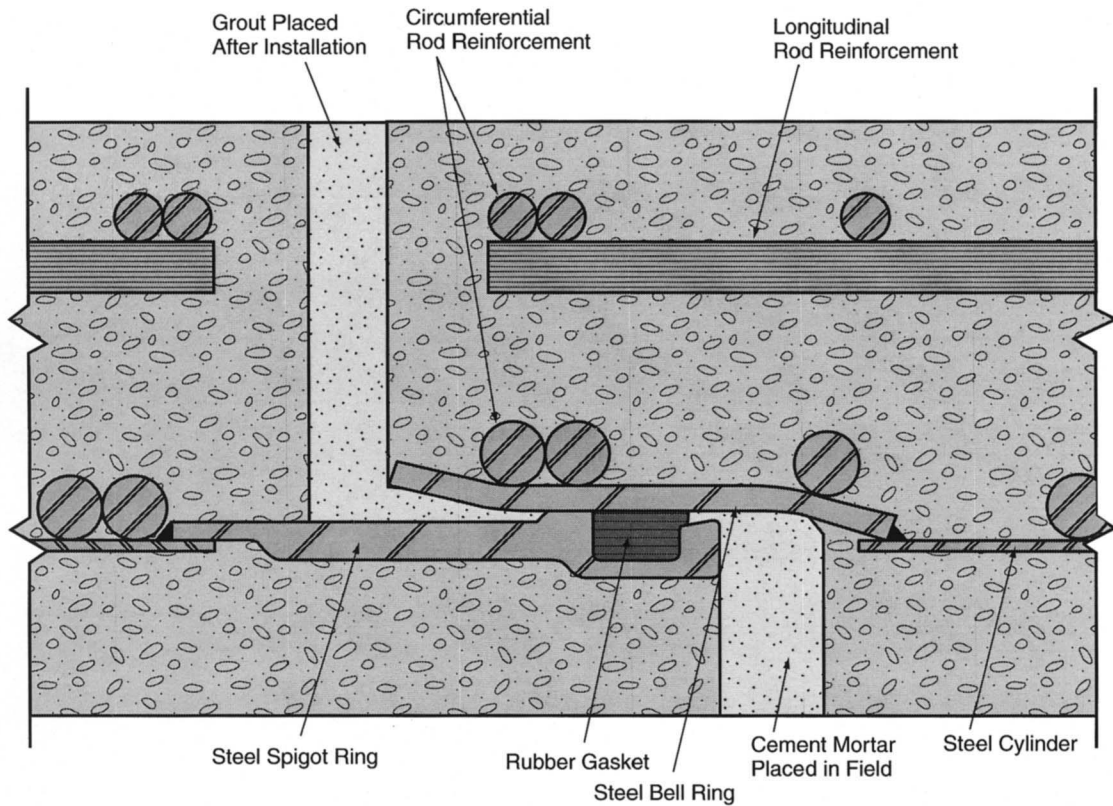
Reinforced concrete cylinder pipe (AWWA C300-type pipe)
